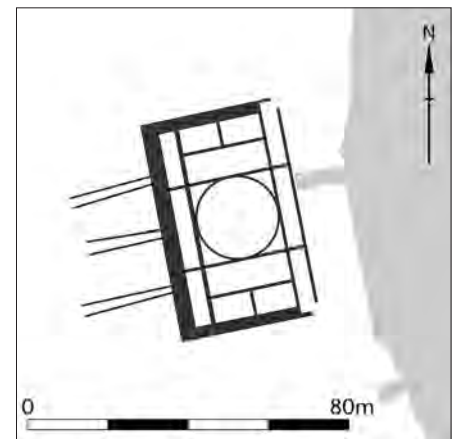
Punta della Vipera, fish-pond with thick concrete outer walls.
